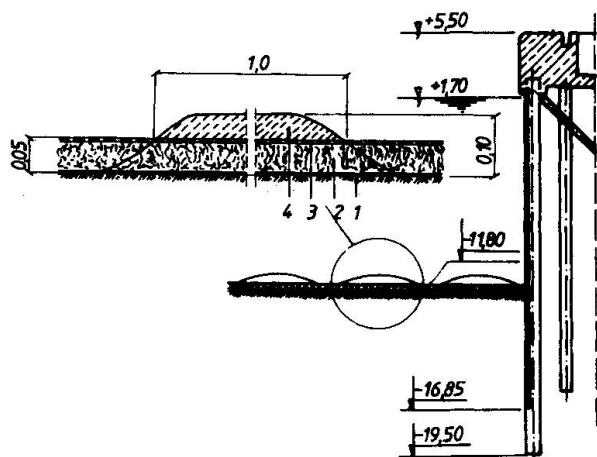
Bottom protection using geotextiles [2]: 1-woven textile, 2-geomembrane with sand, 3-reinforcing geotextile, 4-mortar
